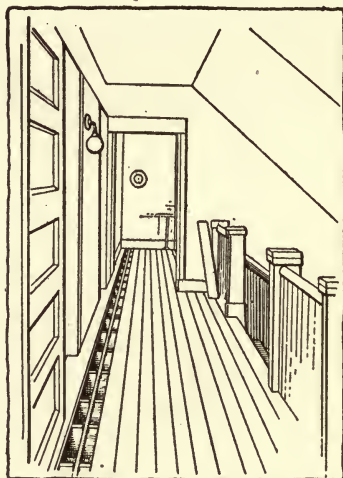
Second-story floor boards removed and conduit in place in slots in joists.
